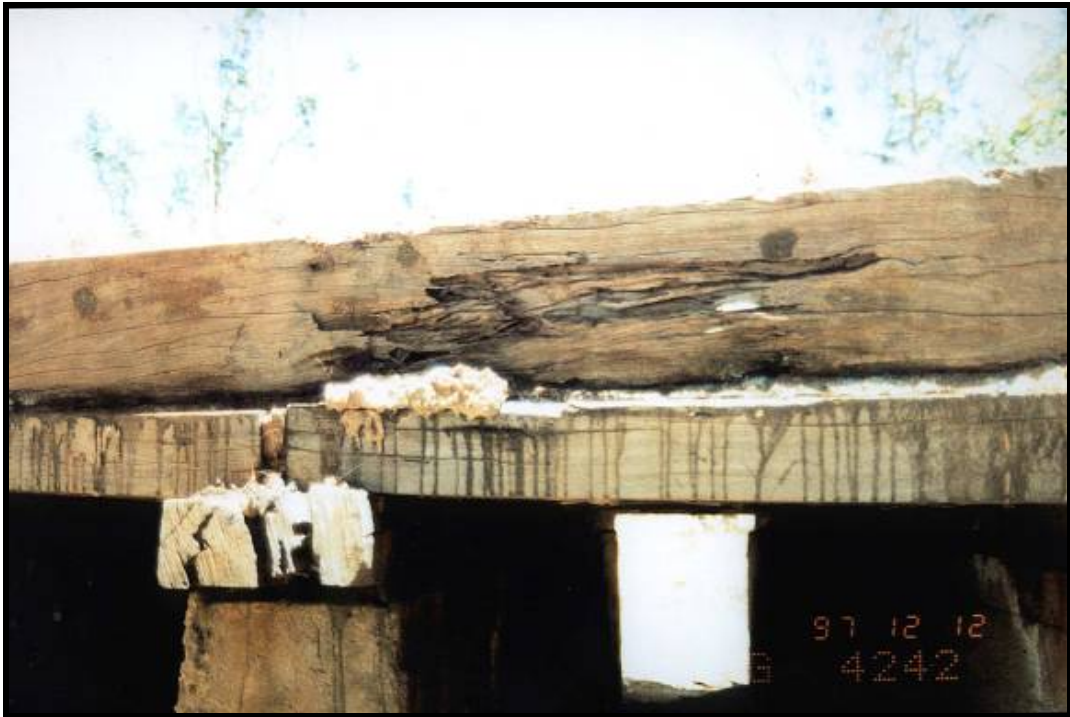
ROTTED TIMBER KERBS (and timber fullcap) – REQUIRE REPLACEMENT
